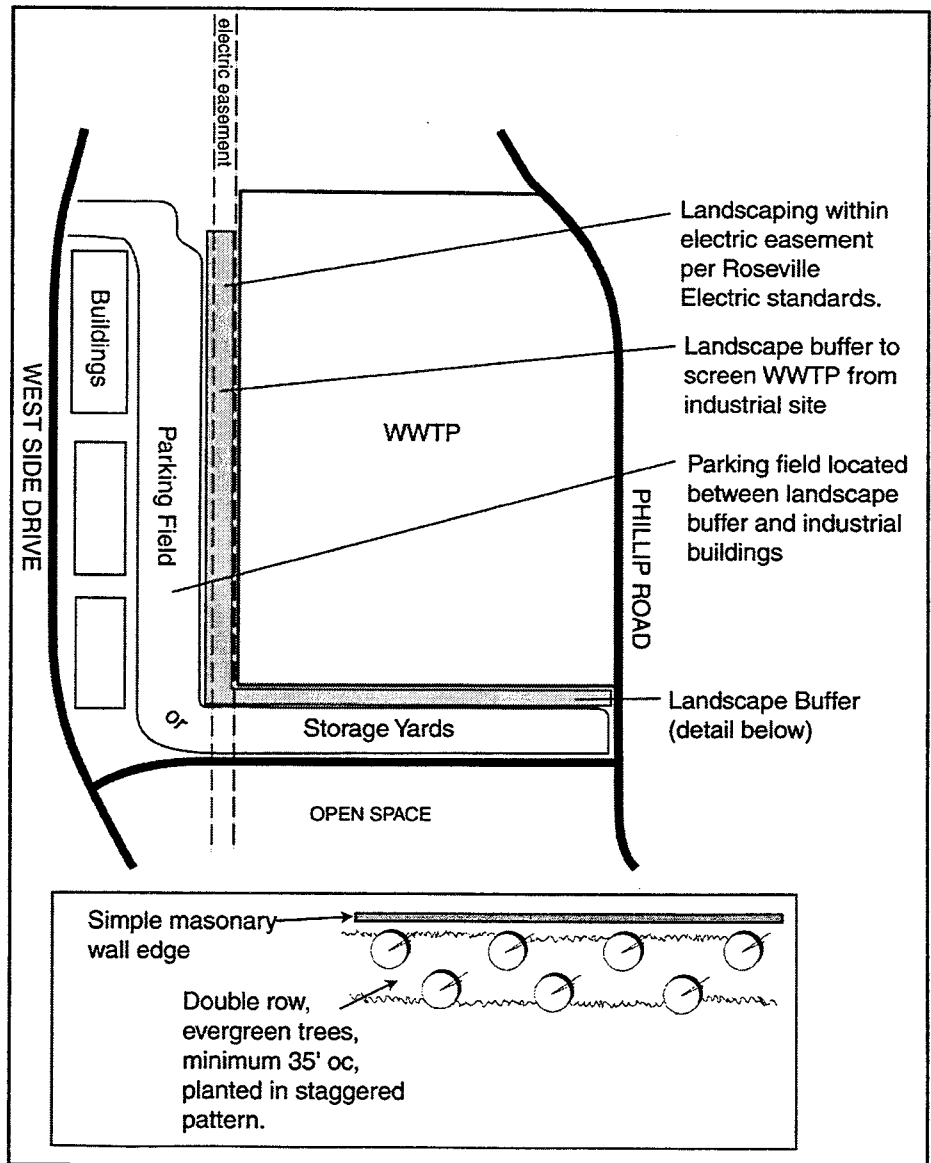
Wastewater Treatment Plant/Industrial Site Interface
